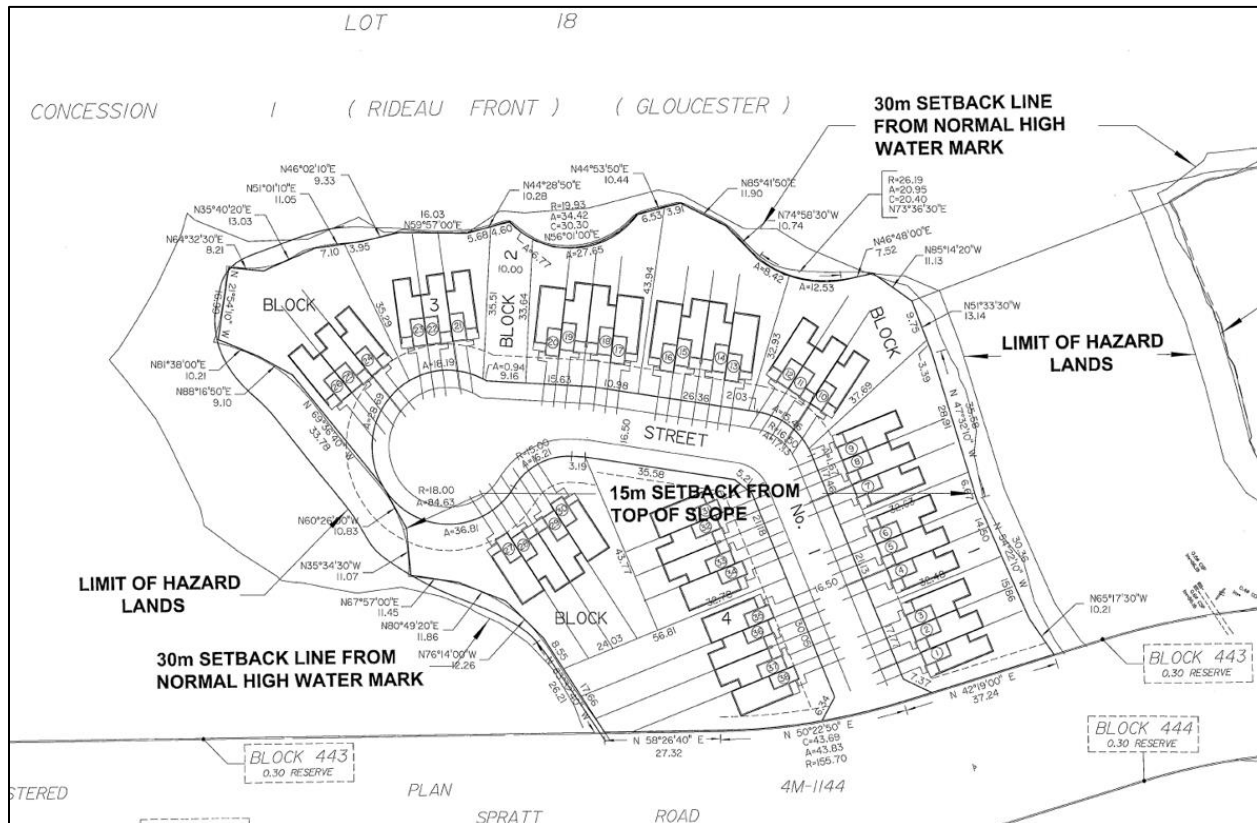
Concept Plan of Block 14 of the proposed Plan of Subdivision (prepared by RSDC)
